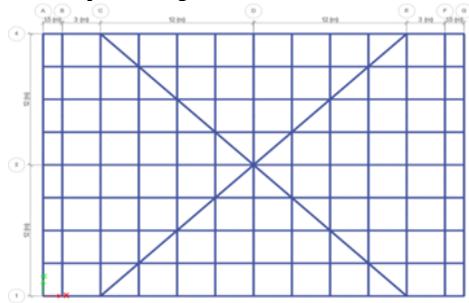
Space structure with double axis stiffness with vertical and horizontal cross bracings bracing roof and fixed support
